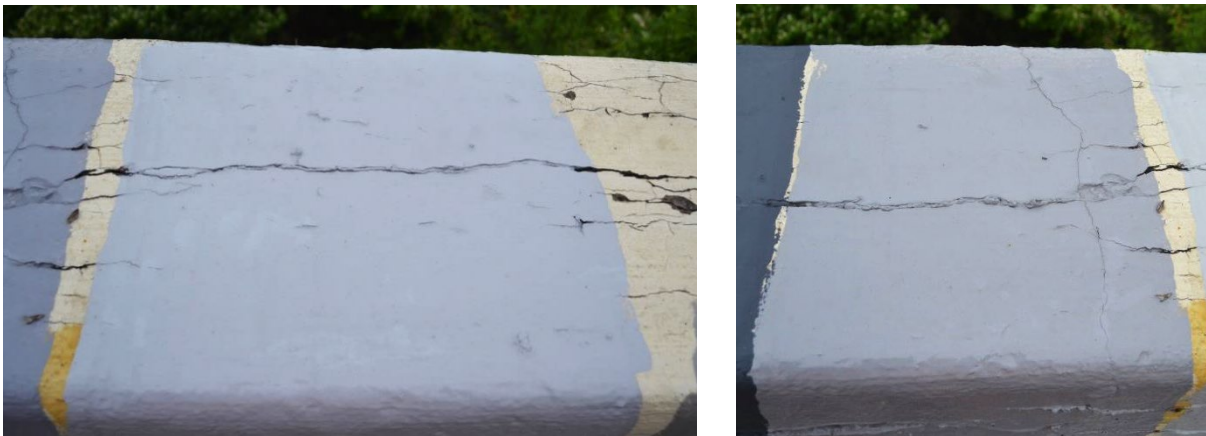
Surface cracking through the polyaspartic coating placed over existing epoxy on the top of the parapet wall (the cap)
